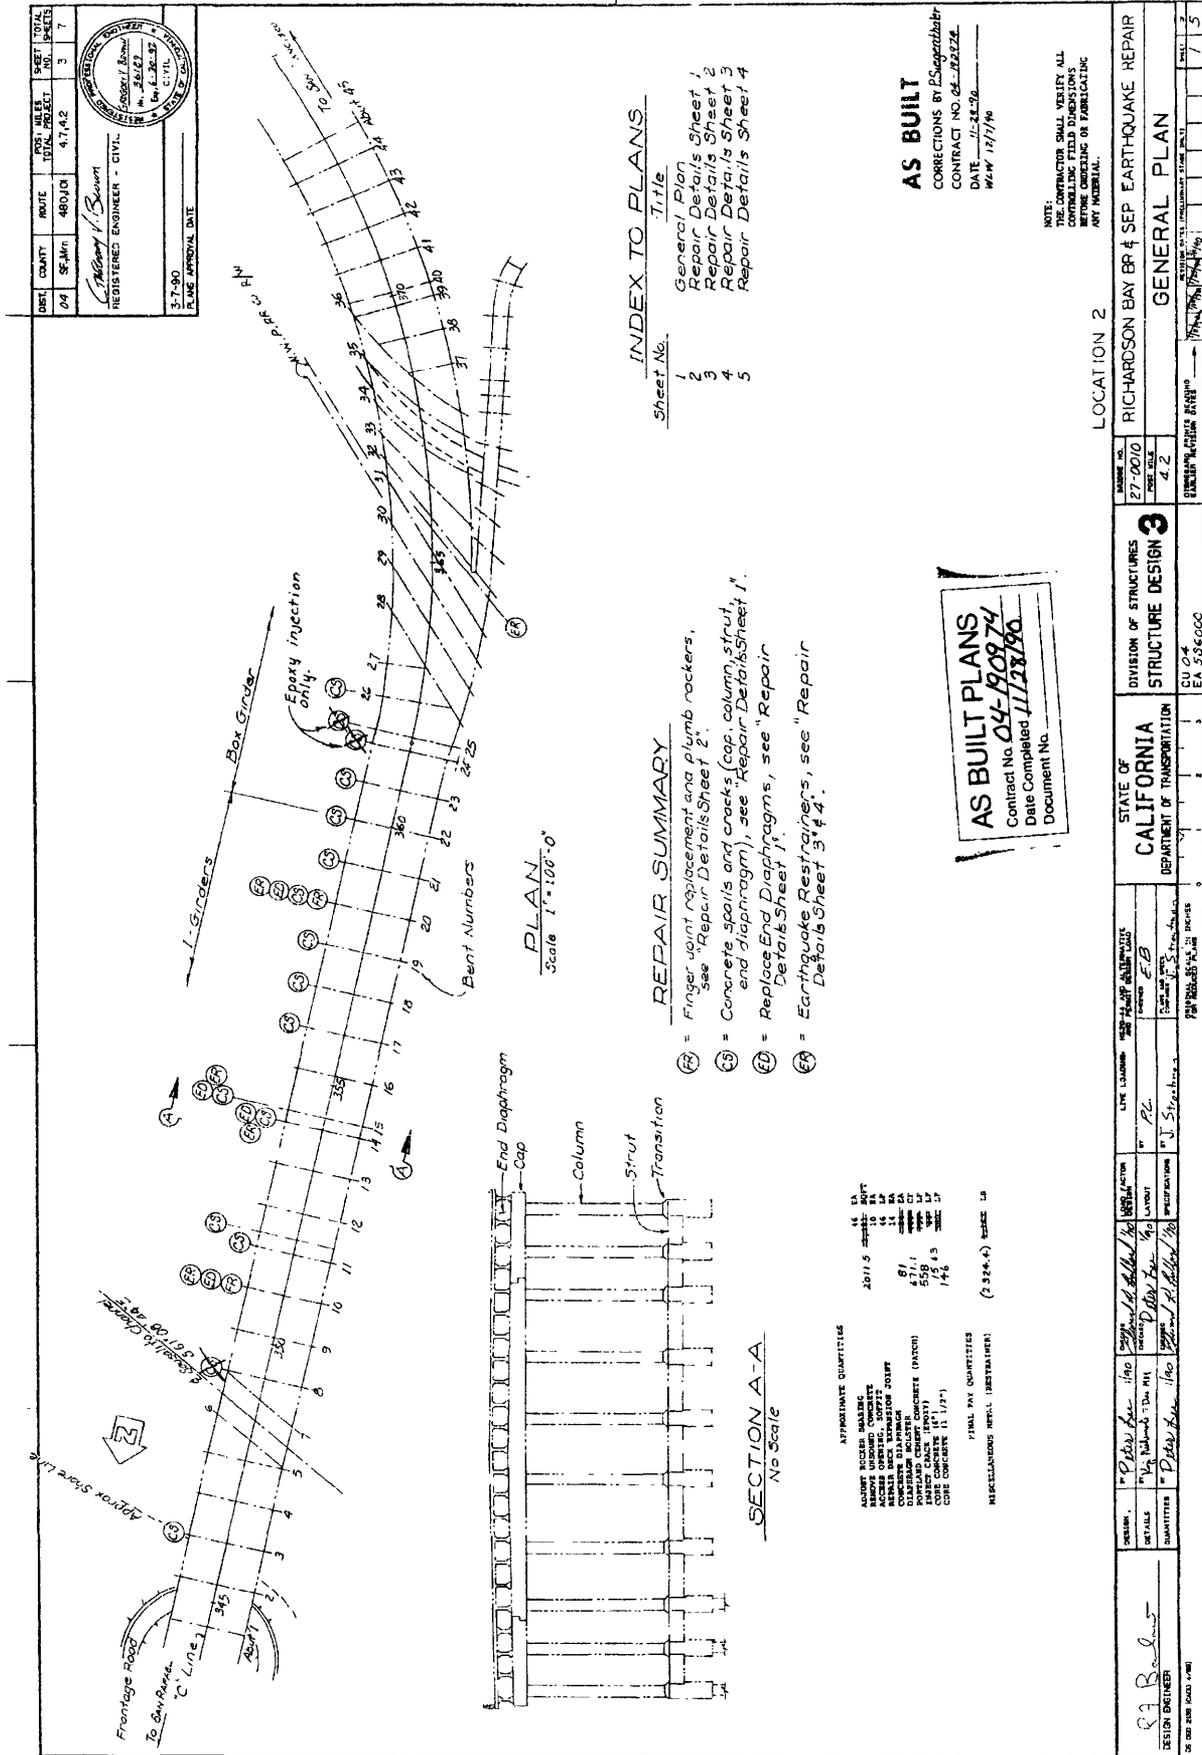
General Plan drawing of repair for Richardson Bay Bridge and Separation.
